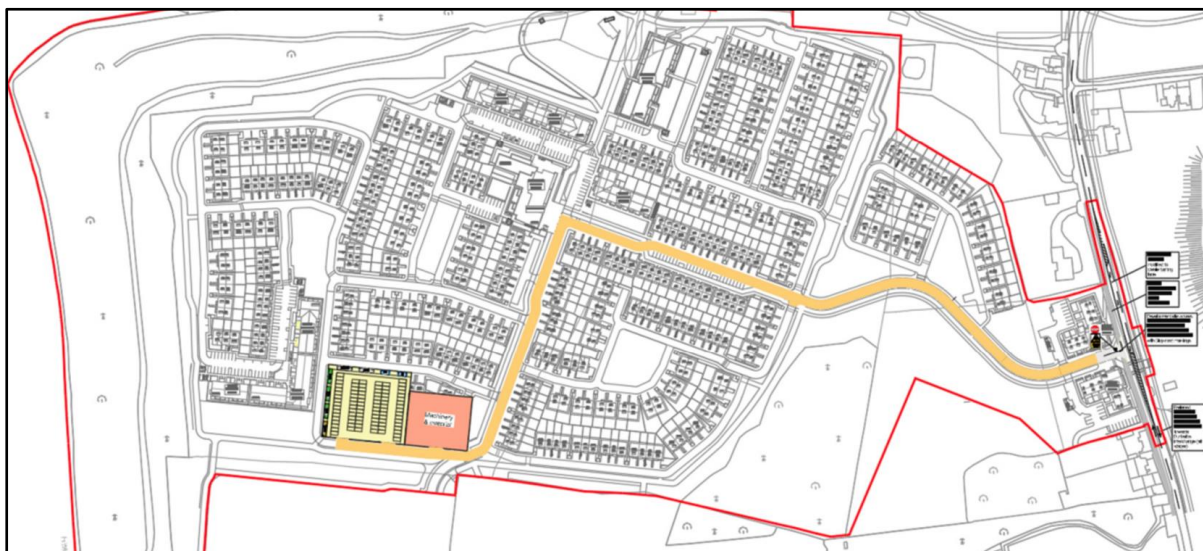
Site Facilities and access, general site development process (Source: OCEMP)
